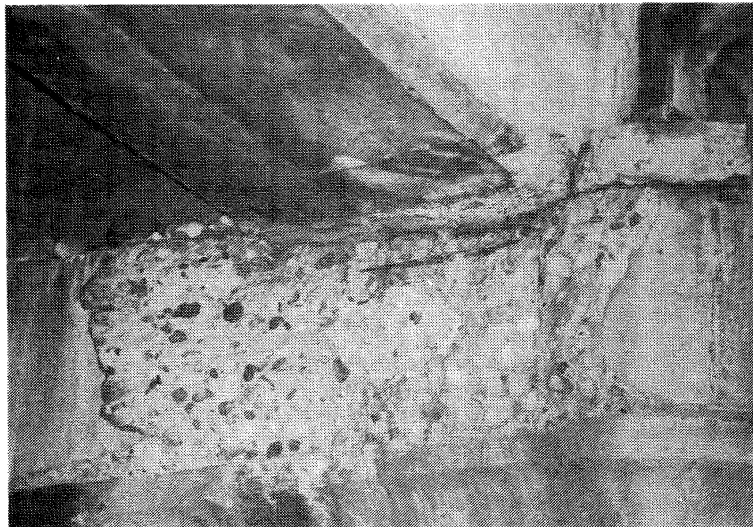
Spalling of pier cap due to deck beam bearing down on outer edge. The gap between pier cap and beam soffit had been packed with mortar to protect the bearing plate from corrosion
